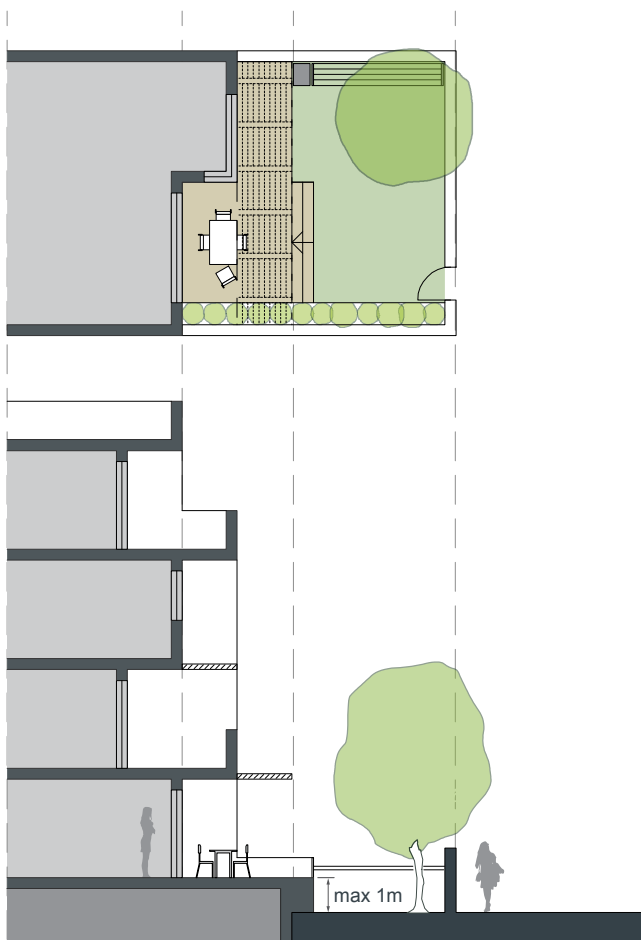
B.4 Plan and section of a ground floor apartment with an elevated terrace and a level private courtyard
